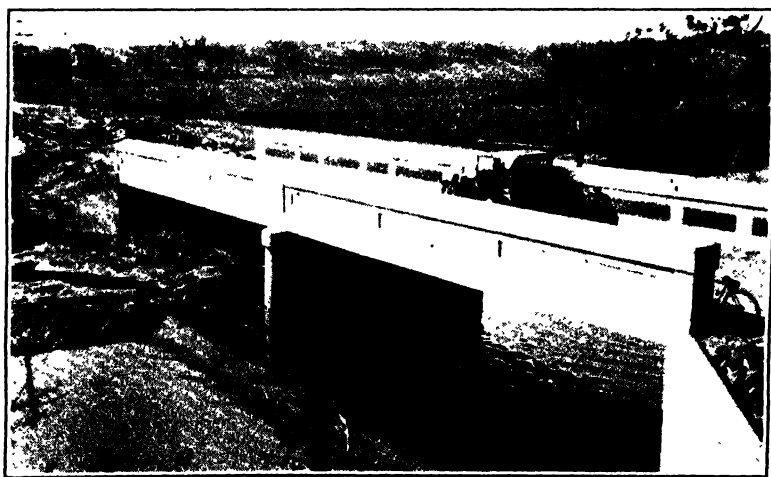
Through girder bridge built in 1920 near Springfield, Illinois—spans 50 ft. each—roadway 20 ft.
